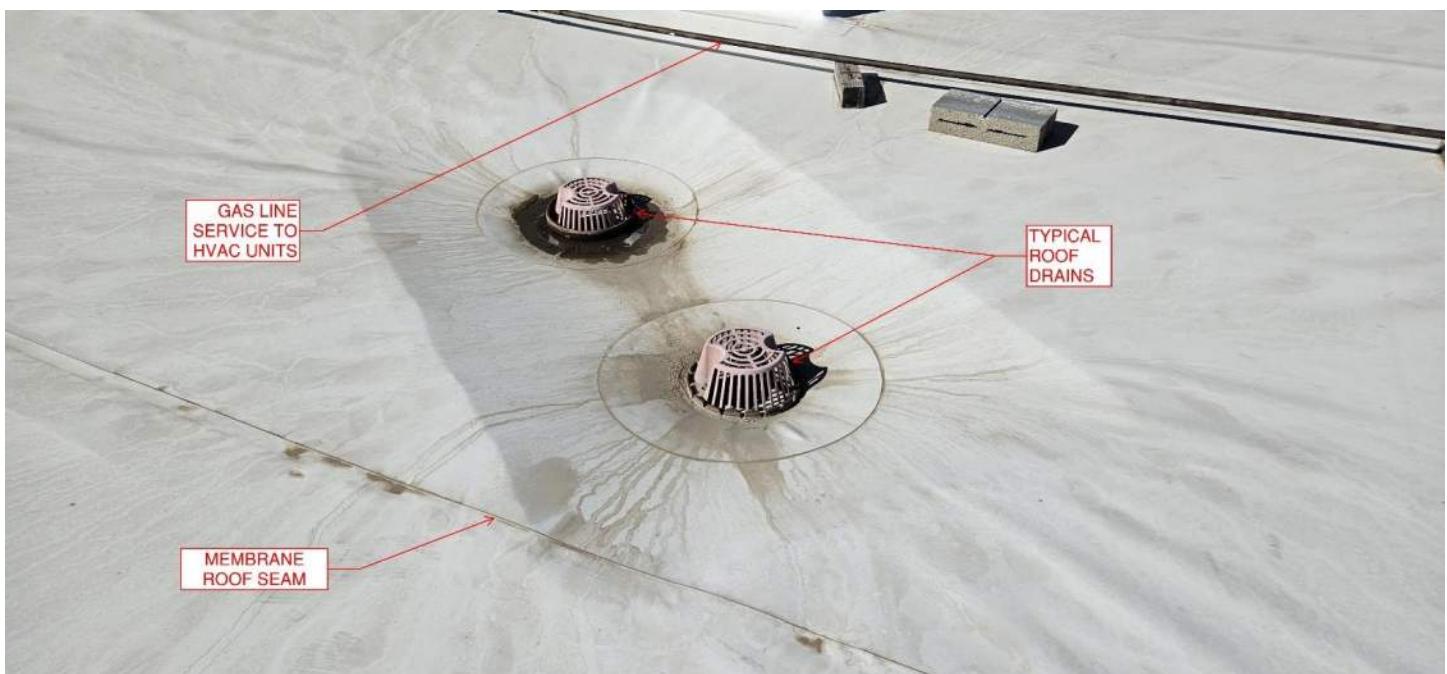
ROOF DRAINS IN THE MEMBRANE ROOF
